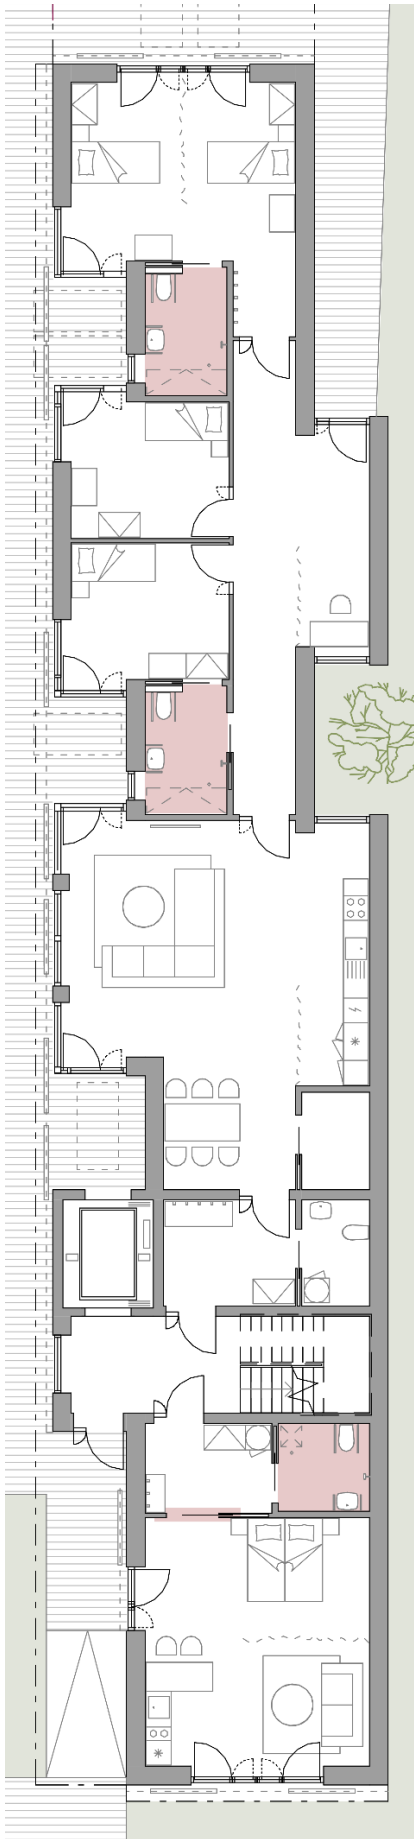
Original floor plan design of the building – Type B – Family type house with the marking of spaces to be changed. (Source: Rollová, Bošková Filová, 2023)
